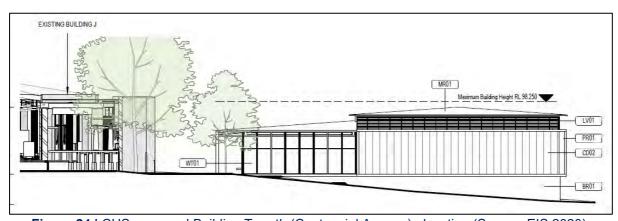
| CHS proposed Building T north (Centennial Avenue) elevation (Source: EIS 2020)
